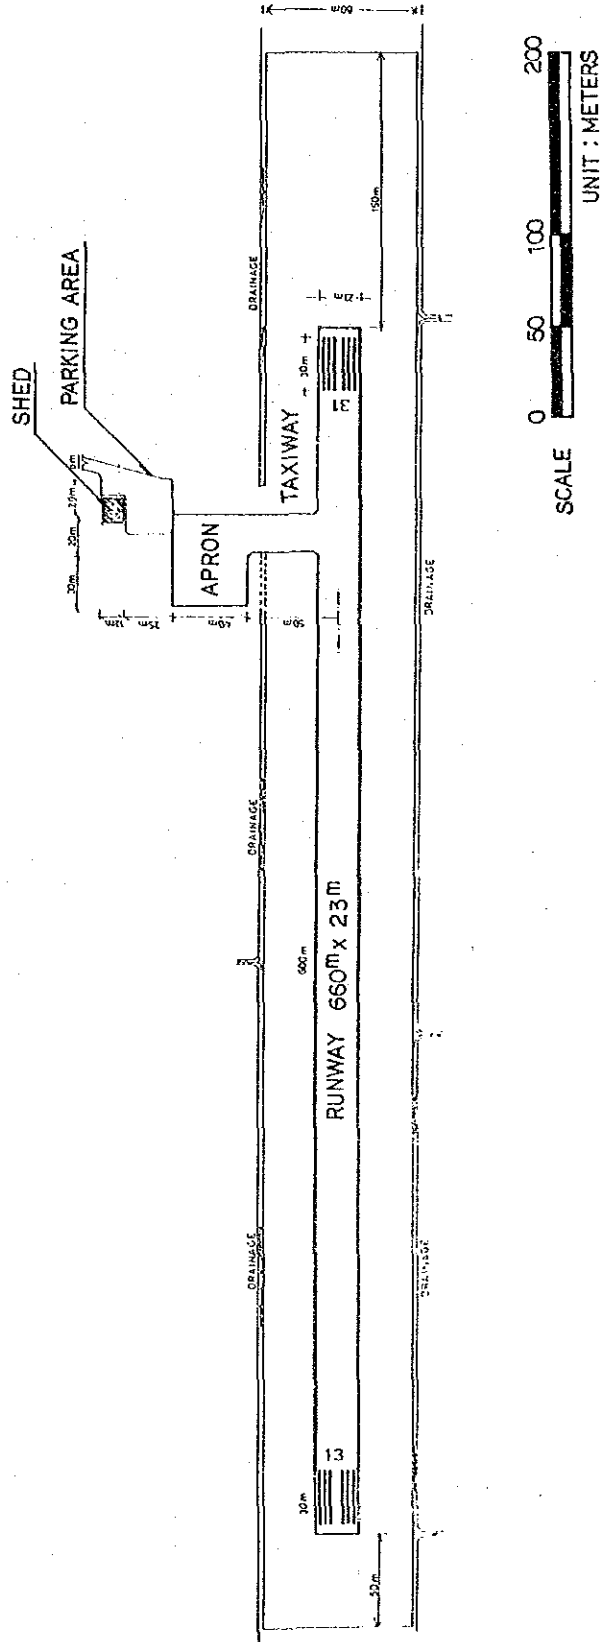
Existing Layout of Cilacap Airstrip
